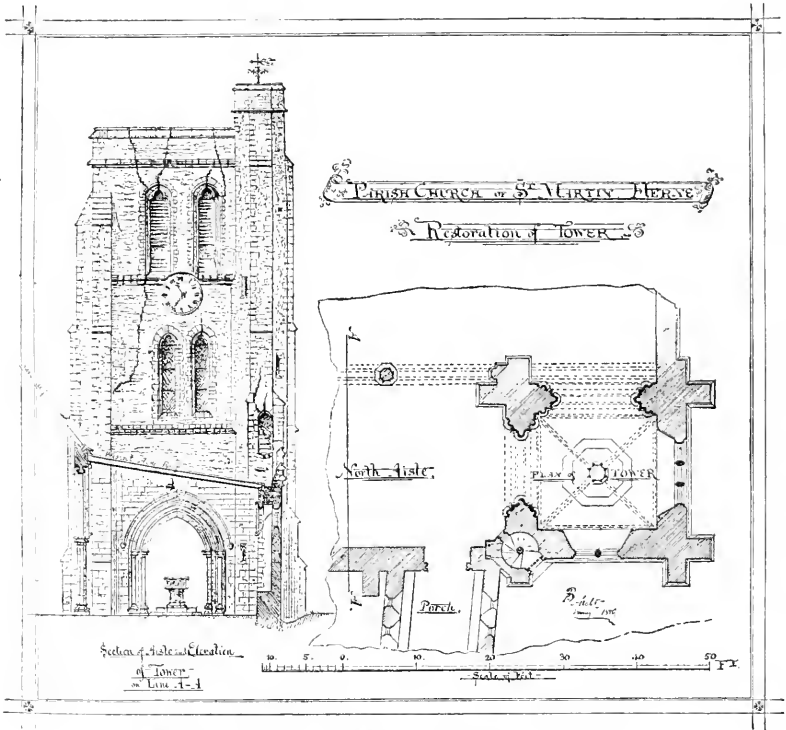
Plate I.—TOWER, SHOWING CRACKS AND FISSURES.
